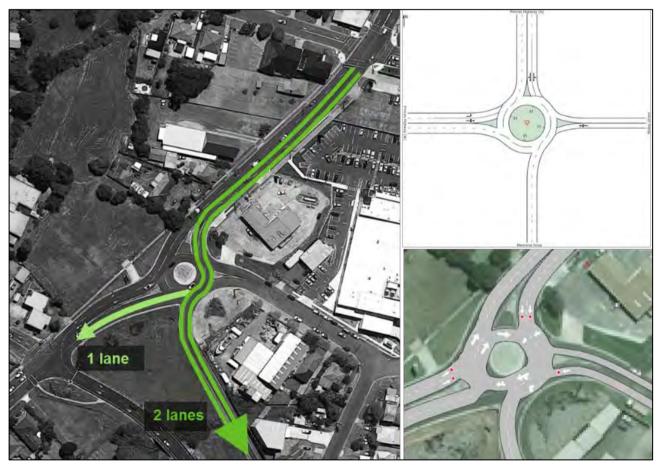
Revised lane allocation at Princes Highway/Molloy Street
